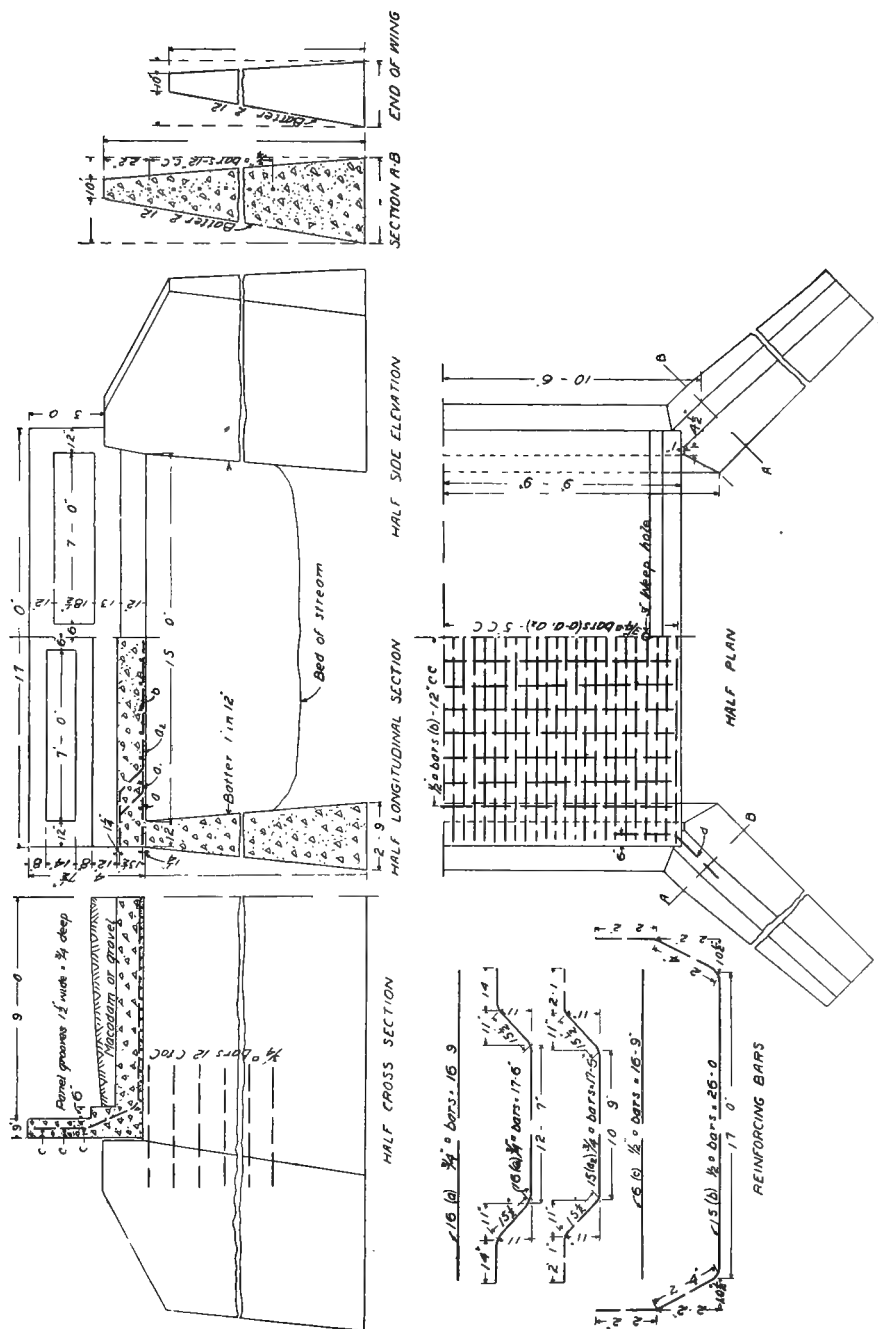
Concrete bridge of 15-foot span at Manhattan, Kans. Designed in the office of the State Engineer at the Kansas State Agriculture College.
